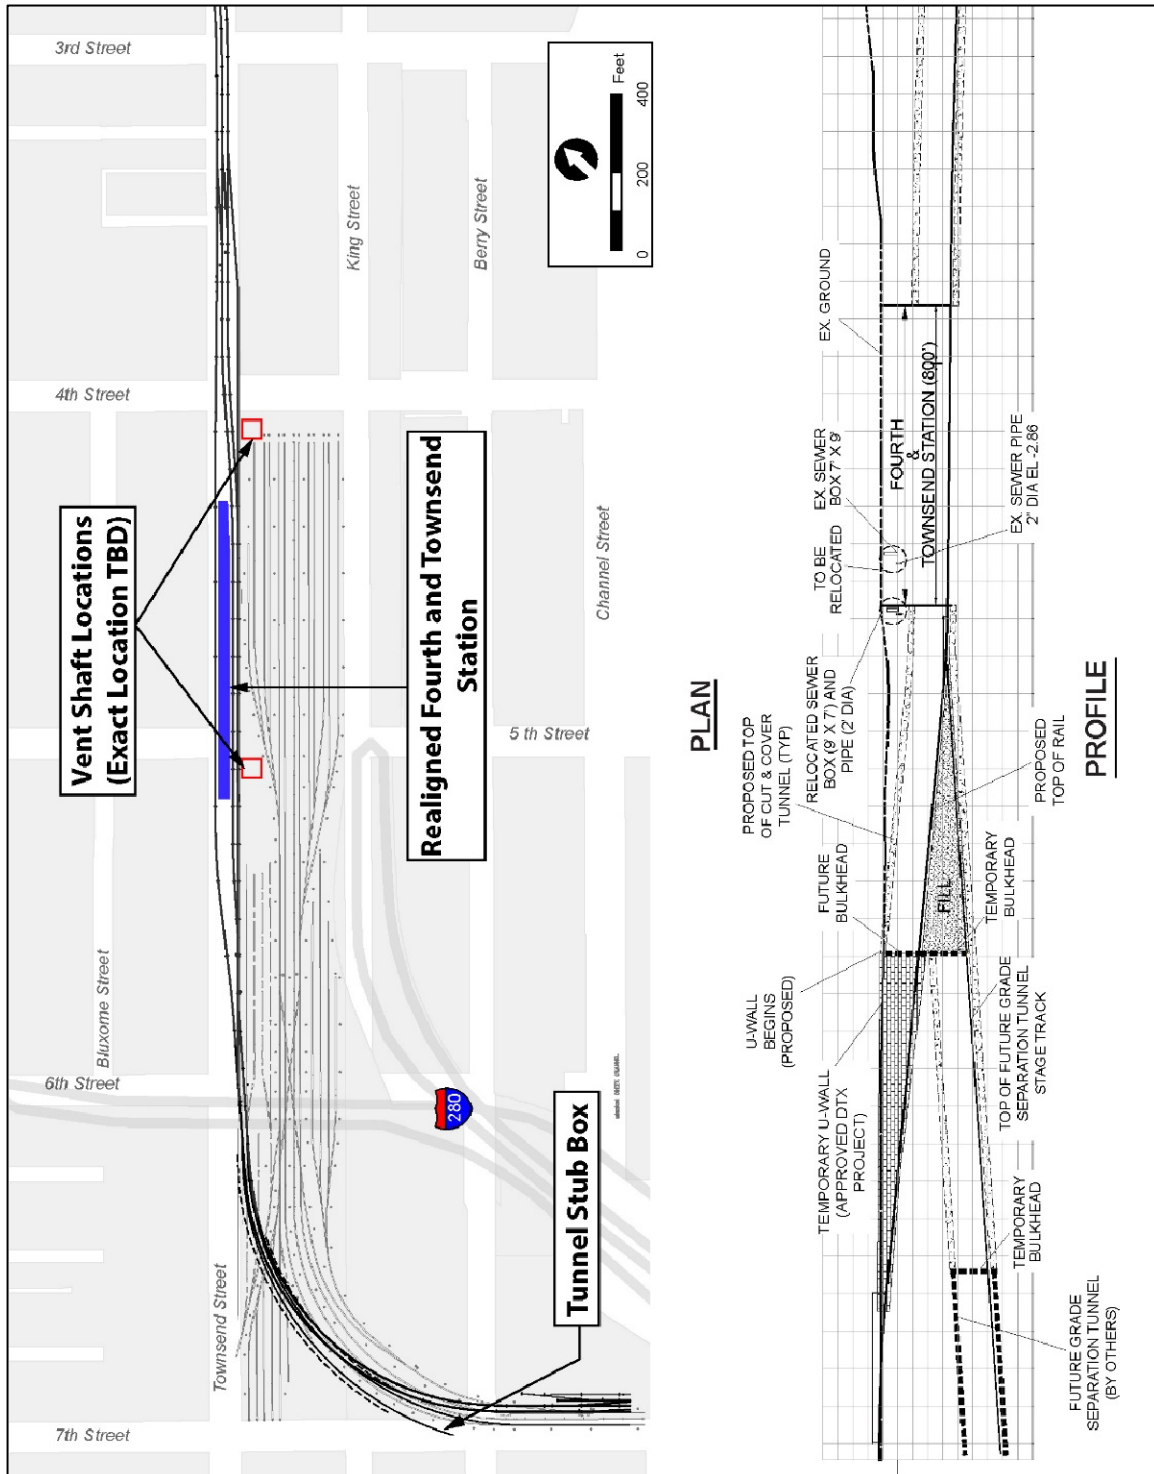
2018 Fourth and Townsend Street Station Plan and Profile to be Modified
